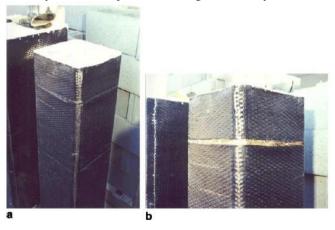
Jacketing of masonry columns with steel meshes (N G Shrive 2006)
